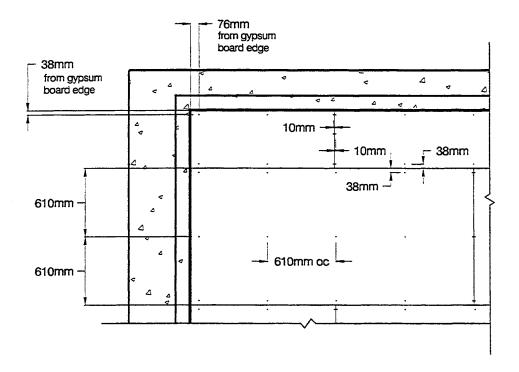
Screw pattern for base layer gypsum board layout, resilient metal channels 610 mm o.c.
